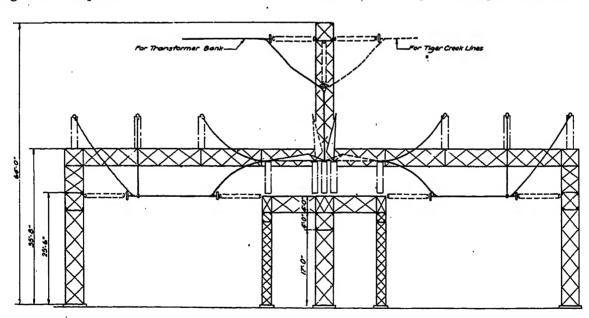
Sections of 220-Kv. Bus-Newark Substation
